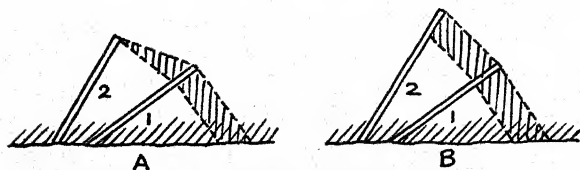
Proper (A) and improper (B) methods of drilling opening holes
